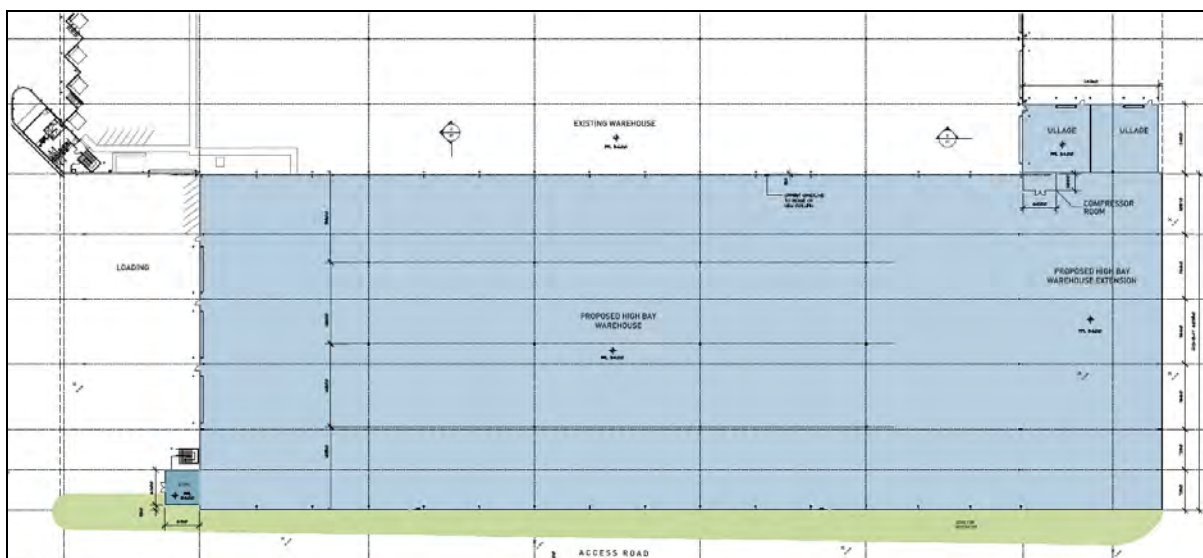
Proposed Warehouse Floor Plan – Stage 5C (Source: Giles Tribe Architects, 2012)
